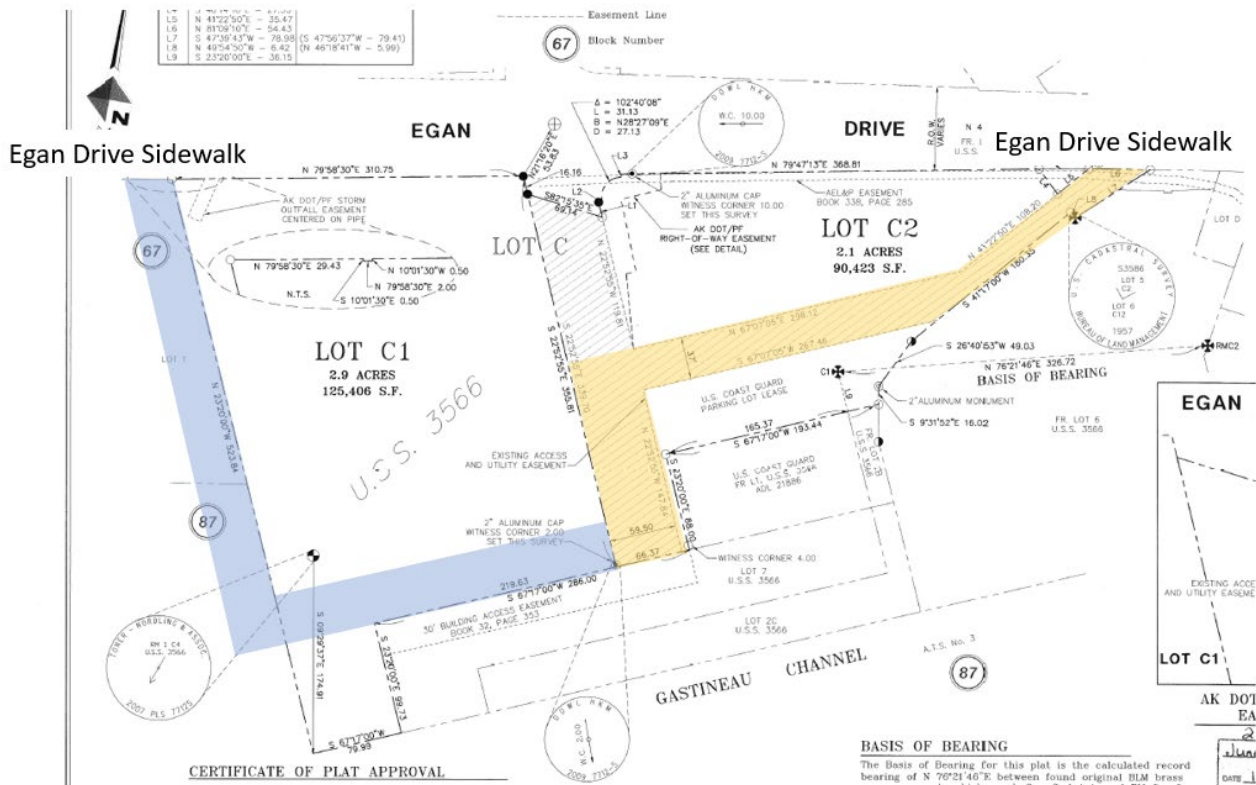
Plat 2009-37 is highlighted to show the connection of the seawalk to Whittier Street and Heat Street.
